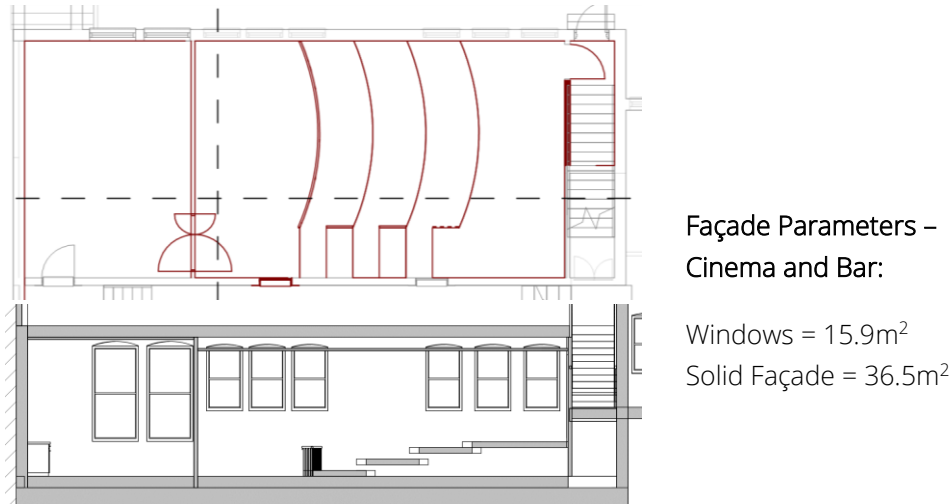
Plan (Top) and Section (Bottom) of Proposed Cinema Room
